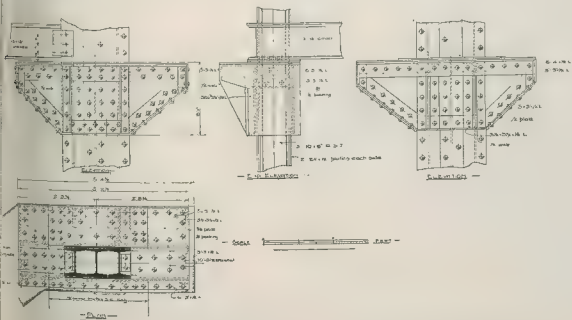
Royal Insurance Building : Detail of Bracket under Pier.
